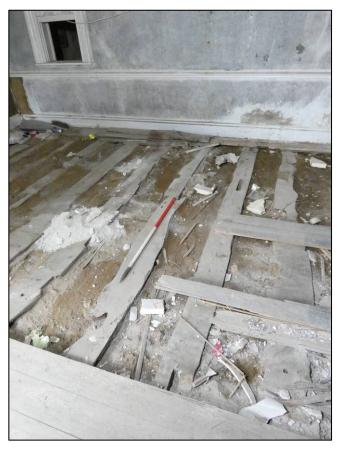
Ground floor north room (GF1), ex-situ timbers reused as floor joists, looking E (photo 1/088).
